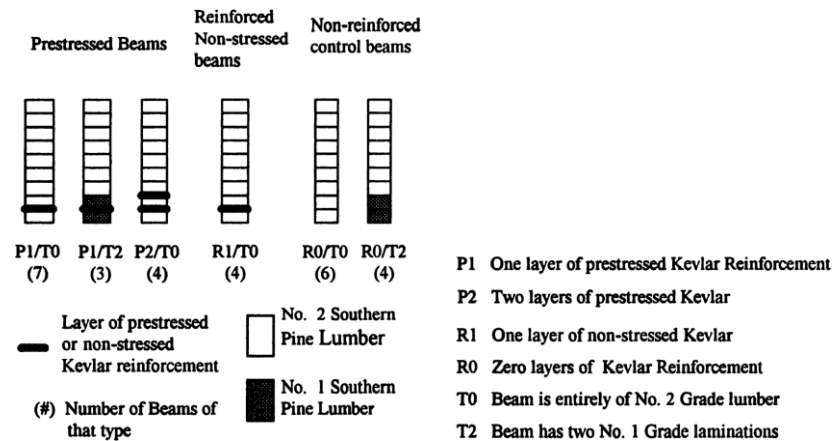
Test matrix of reinforced, pre-stressed, and control beams (Galloway et al. 1996).
